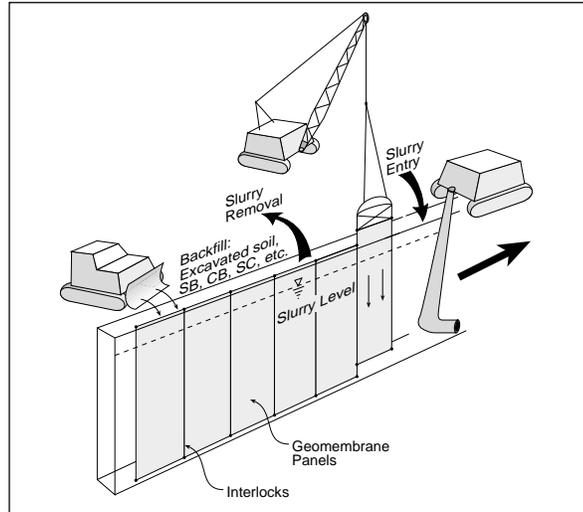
Backhoe excavated, slurry supported method with geomembrane panels and engineered backfill as secondary operation.
